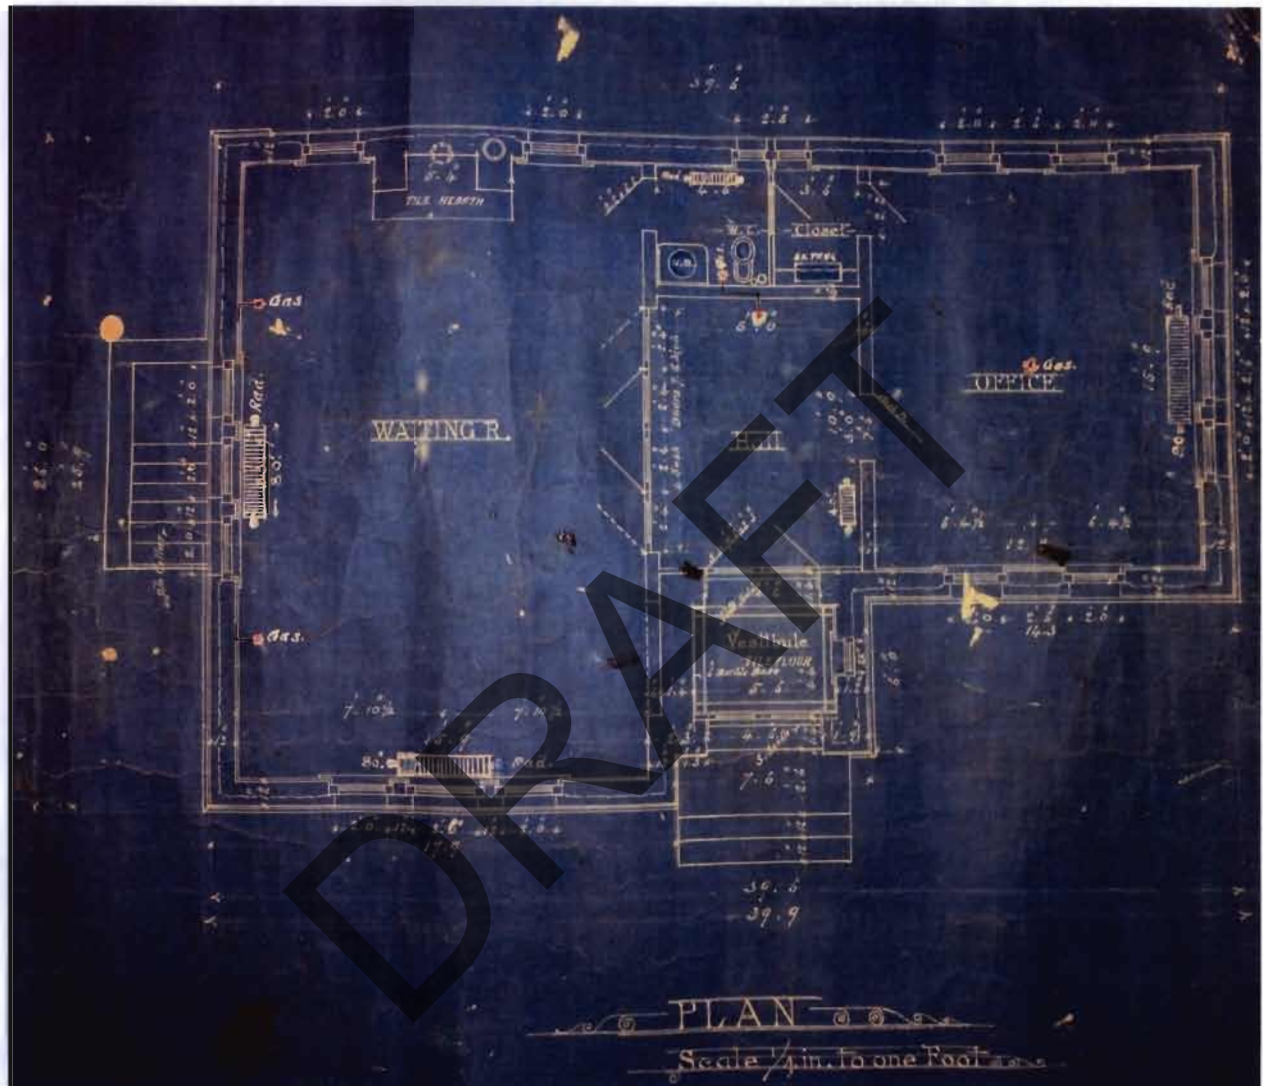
Plan of new gate house by M.J. Fitz Mahoney
